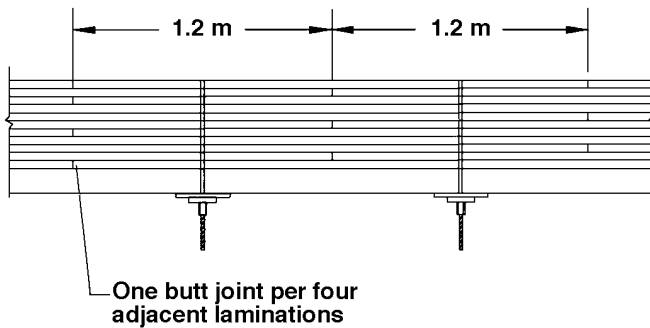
Butt-joint configuration used with Southern Pine sawn lumber flange laminations on the North Siwell Road bridge. A butt joint was placed transverse to the span in every fourth lamination. Longitudinally, butt joints in adjacent laminations were separated by 1.2 m (4 ft).
